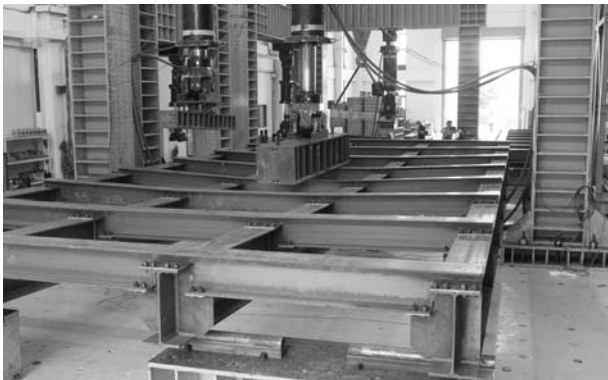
Experiment on the Structural Behavior of New Temporary Bridge System
